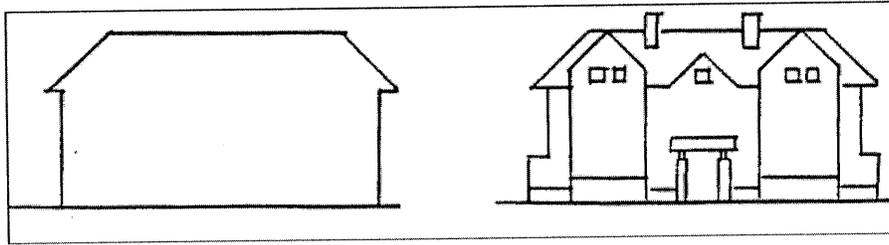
Schematic elevation sketches of two multi-storied buildings with equal heights and widths. Architectural details such as porches, windows and roof dormers articulate a buildings facade (right) which enhances visual quality and contributes to a human scaled development.
